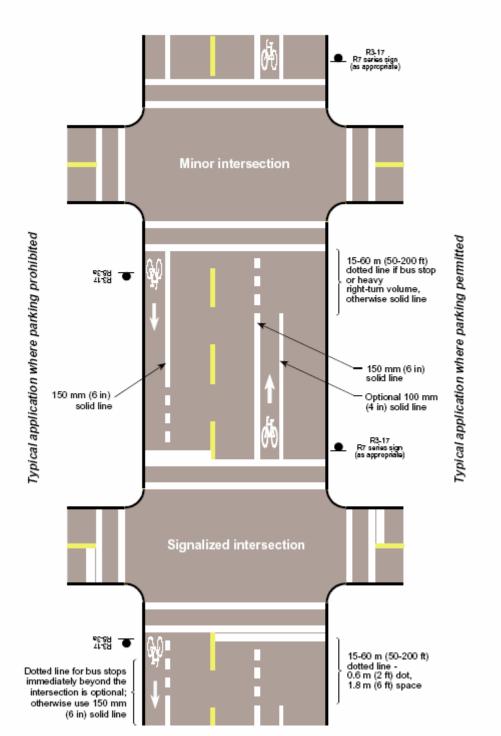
TYPICAL PAVEMENT MARKINGS FOR BIKE LANE ON TWO LANE STREET
